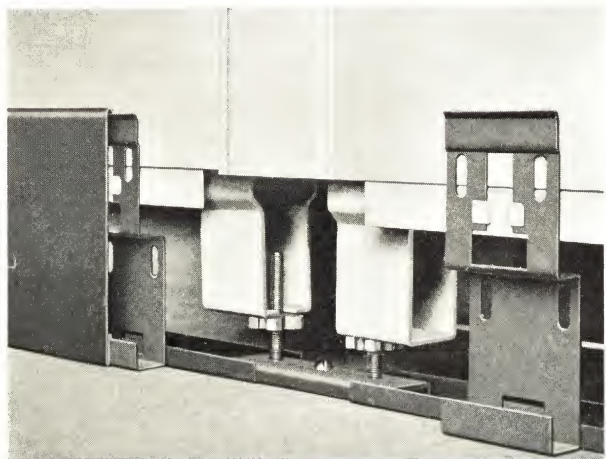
Patented Leveling Device Holding Floor Channel in Perfect Alignment from Pilaster to Pilaster
